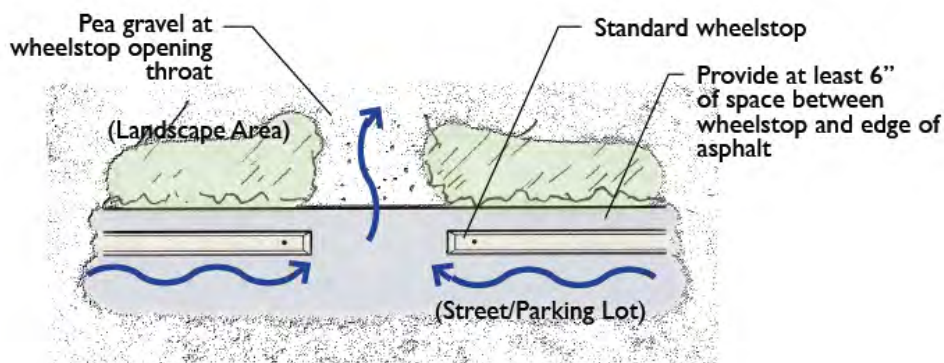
Opening between wheelstop curbs: plan view (Source: SMCWPPP 2009)
